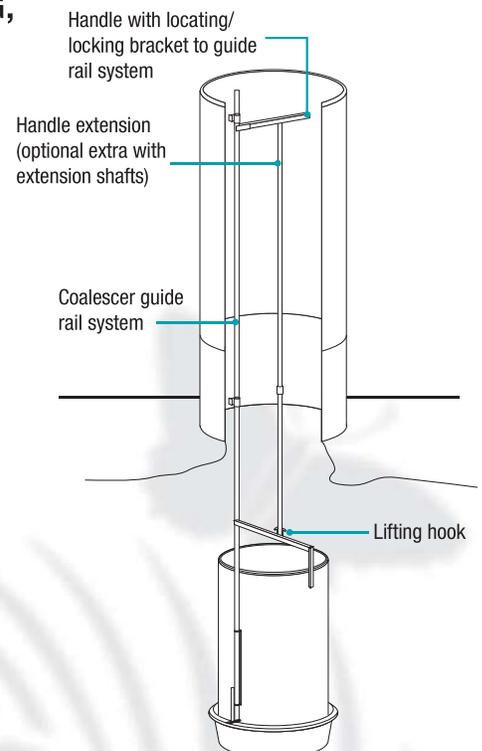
SPEL coalescer unit guide rail system/lifting, locating and locking system
